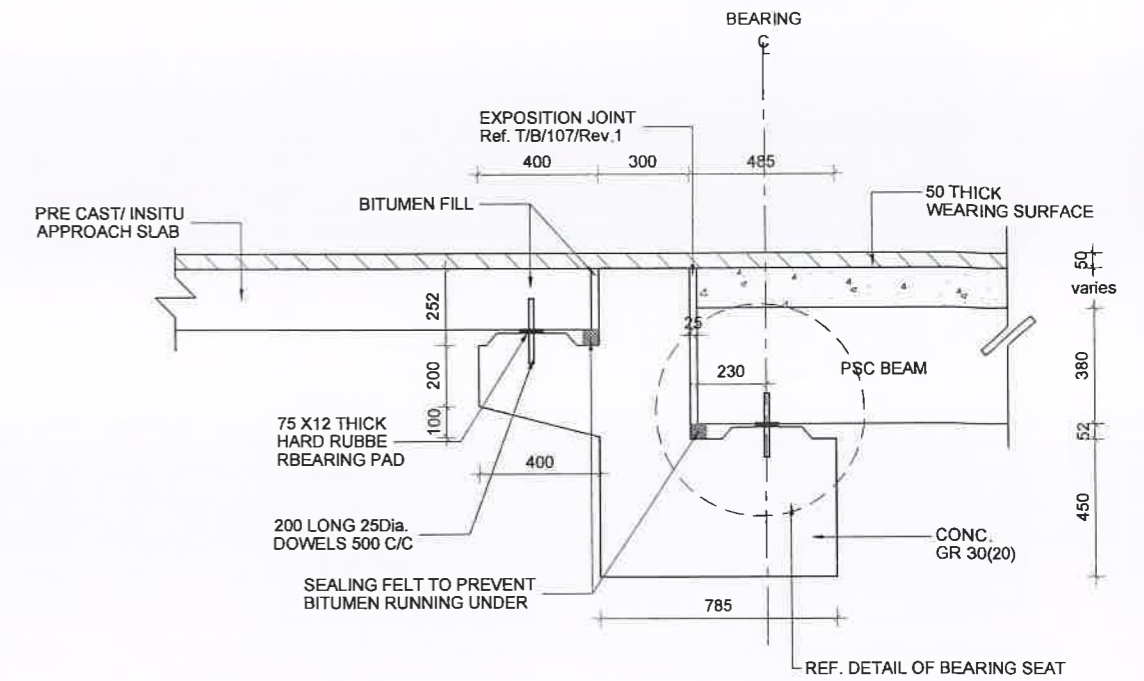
DETAIL OF ABUTMENT AND WING WALL PLAN SCALE -
